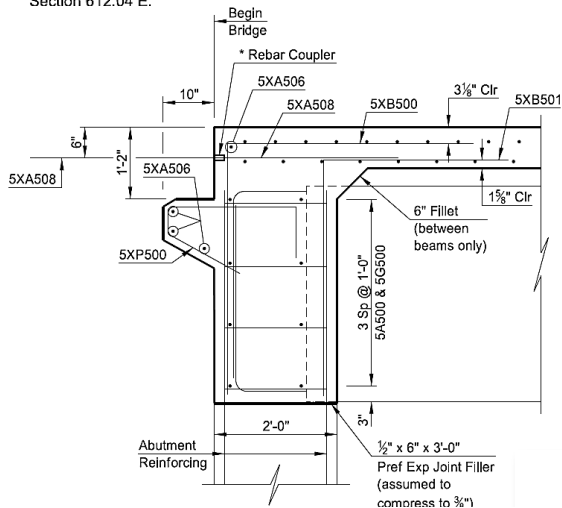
Examples for structural ties between the approach slab and integral bridge abutments.
